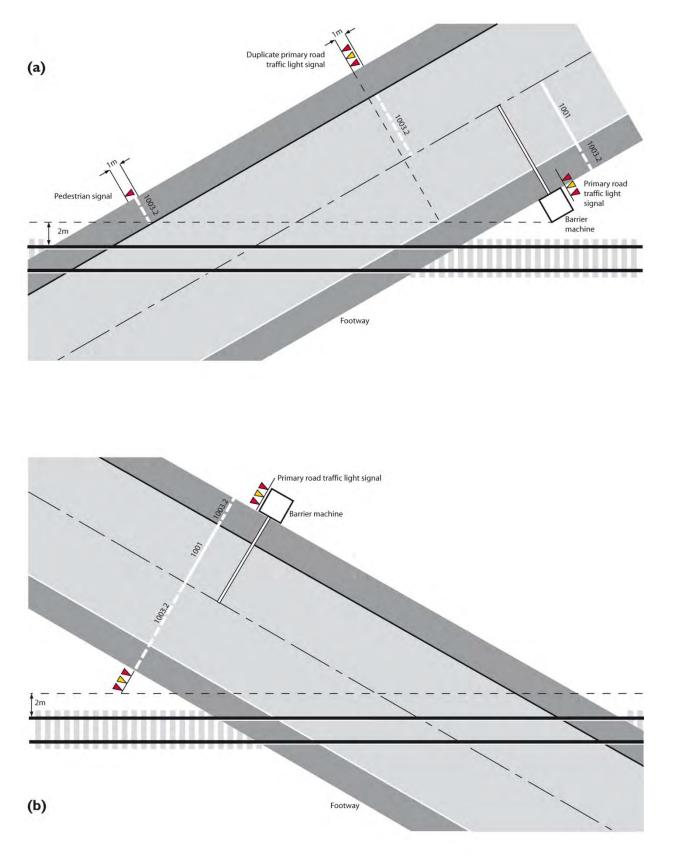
typical layout of an obtuse skew crossing (a) and an acute skew crossing (b) indicating the arrangement of the transverse road markings and road traffic light signals (not to scale)
